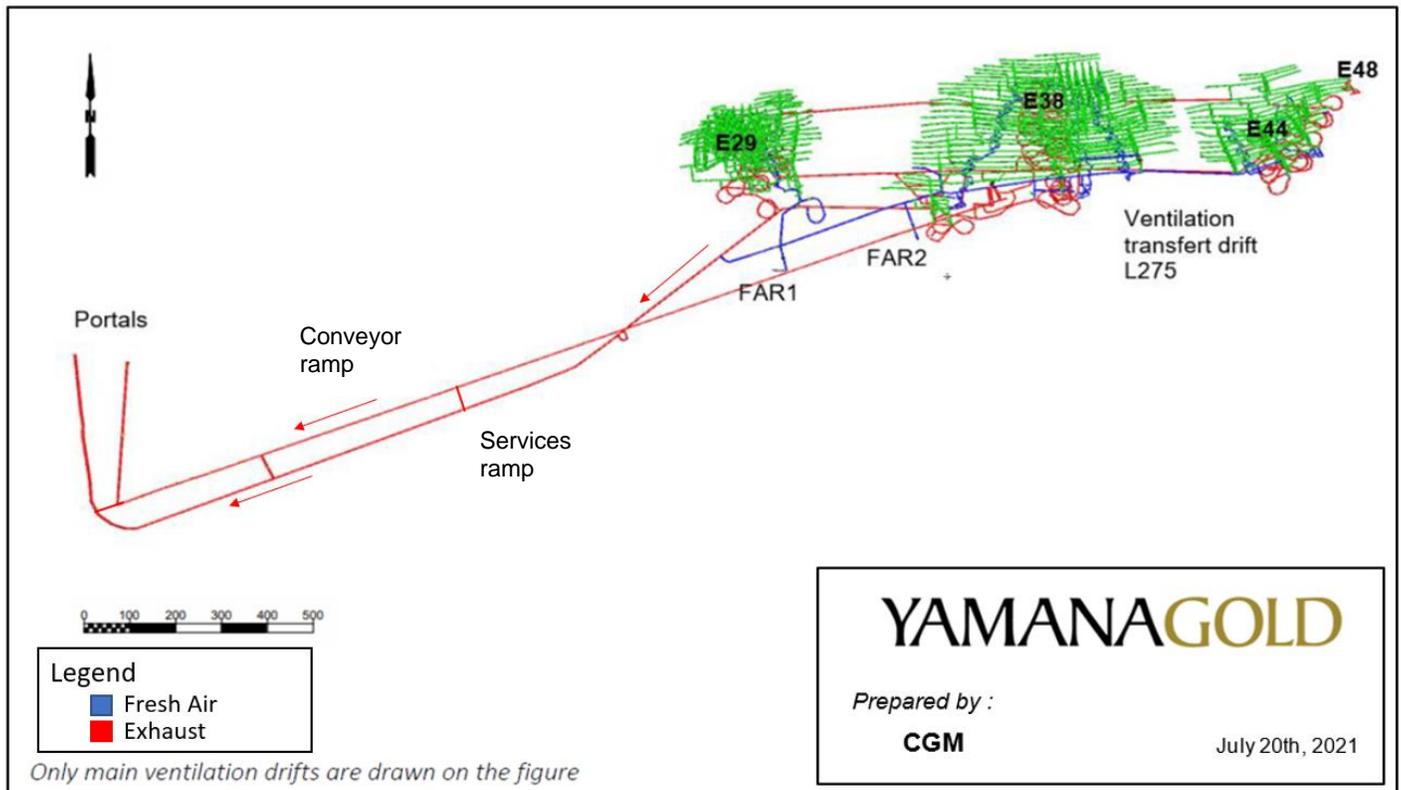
Plan View of Stage 7 of the Pre-production Ventilation Plan of Wasamac
